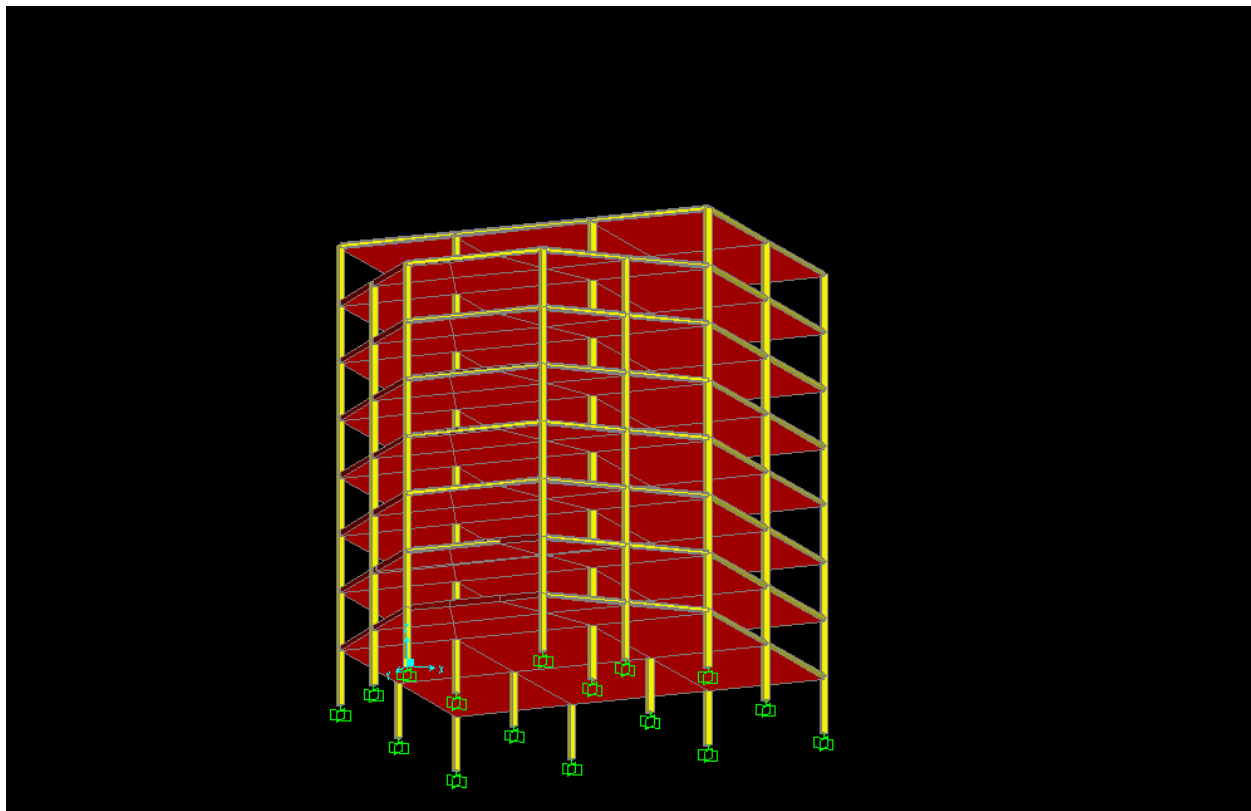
IMAGE OF CONCRETE DESIGN STRUCTURE.
